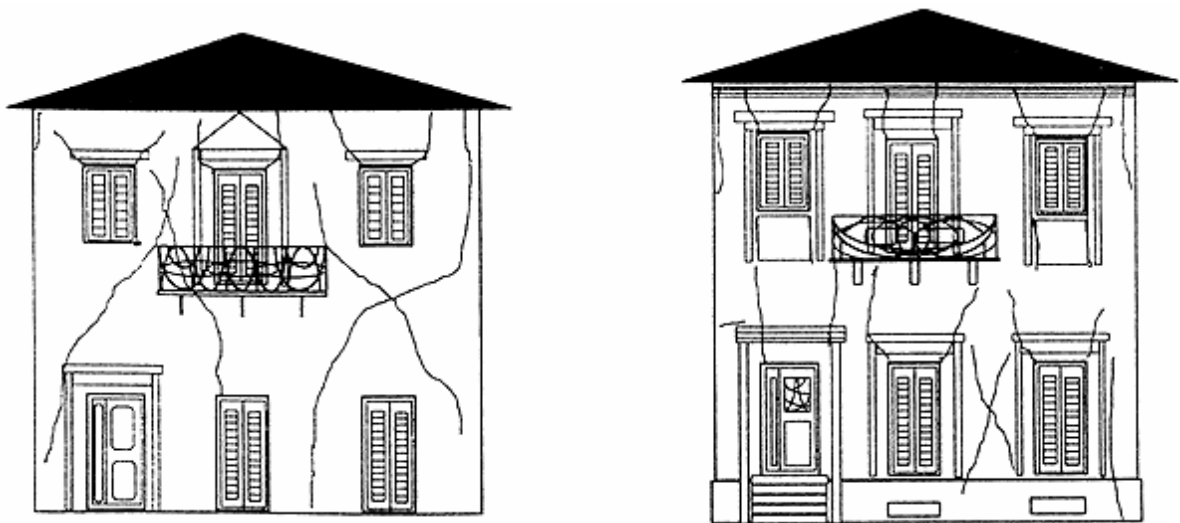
Typical damage patterns of masonry buildings
